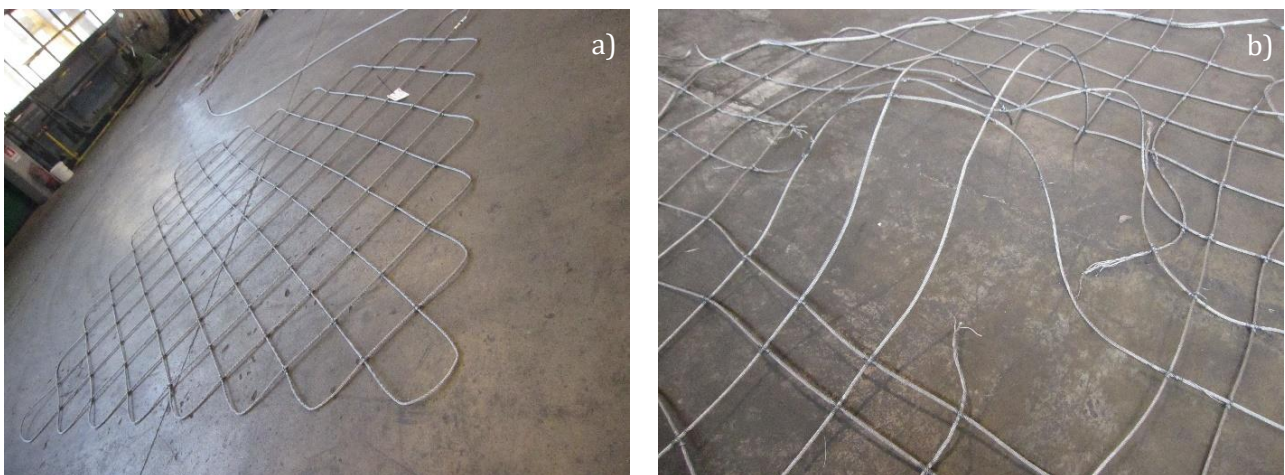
Tested SW panel; a) Specimen before test and b) Specimen brake due to loading process
